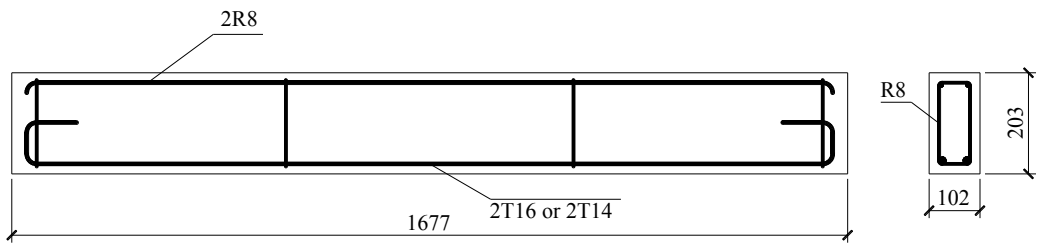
Reinforcement details of concrete beams with 2 R16 bottom longitudinal rebars (unit: mm)
